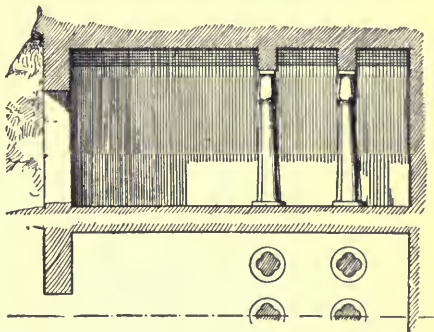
SECTION AND HALF-PLAN OF A TOMB AT BENI-HASSAN.
